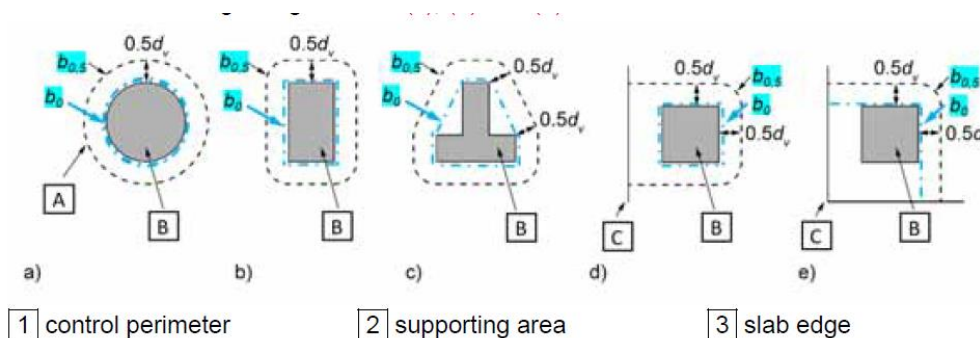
Typical control perimeters $b_{0,5}$ and perimeters b_0 around supporting areas (Aurelio Muttoni F. F.-R., 2020)
